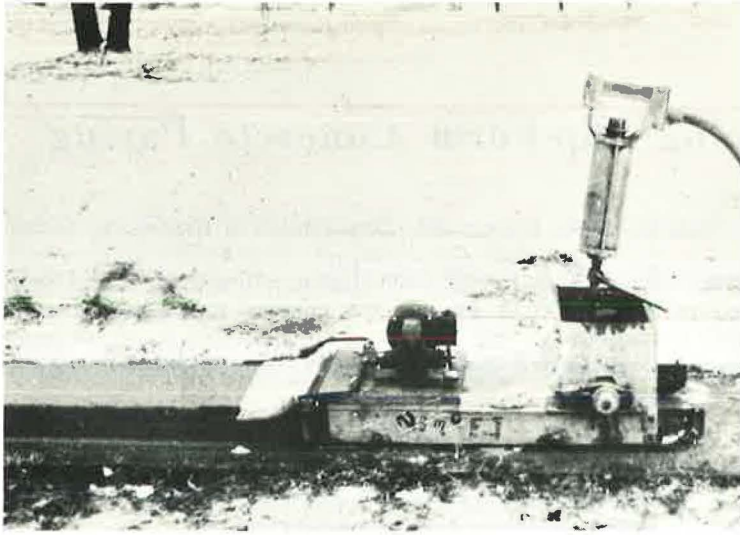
First pilot model slip-form paver; built in Iowa, 1947.
